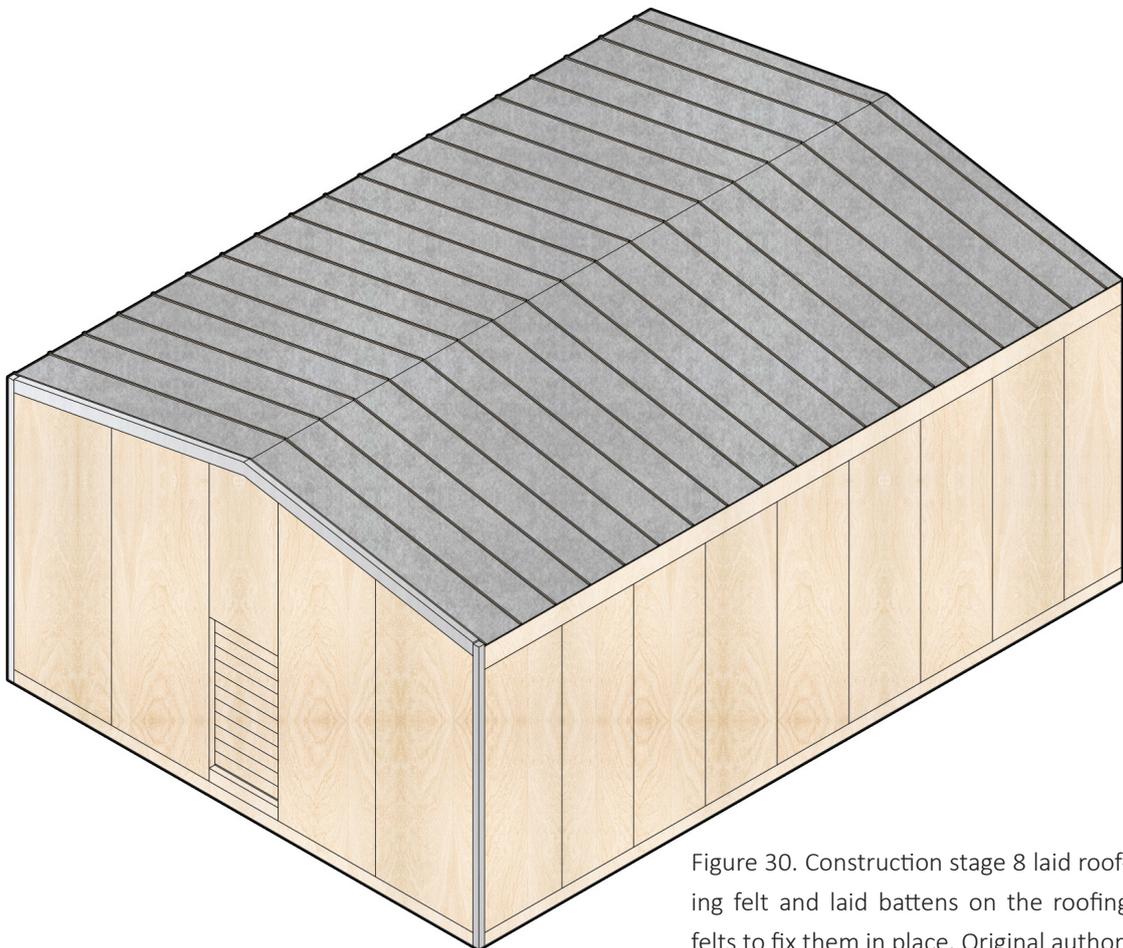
Construction stage 8 laid roofing felt and laid battens on the roofing felts to fix them in place. Original author
